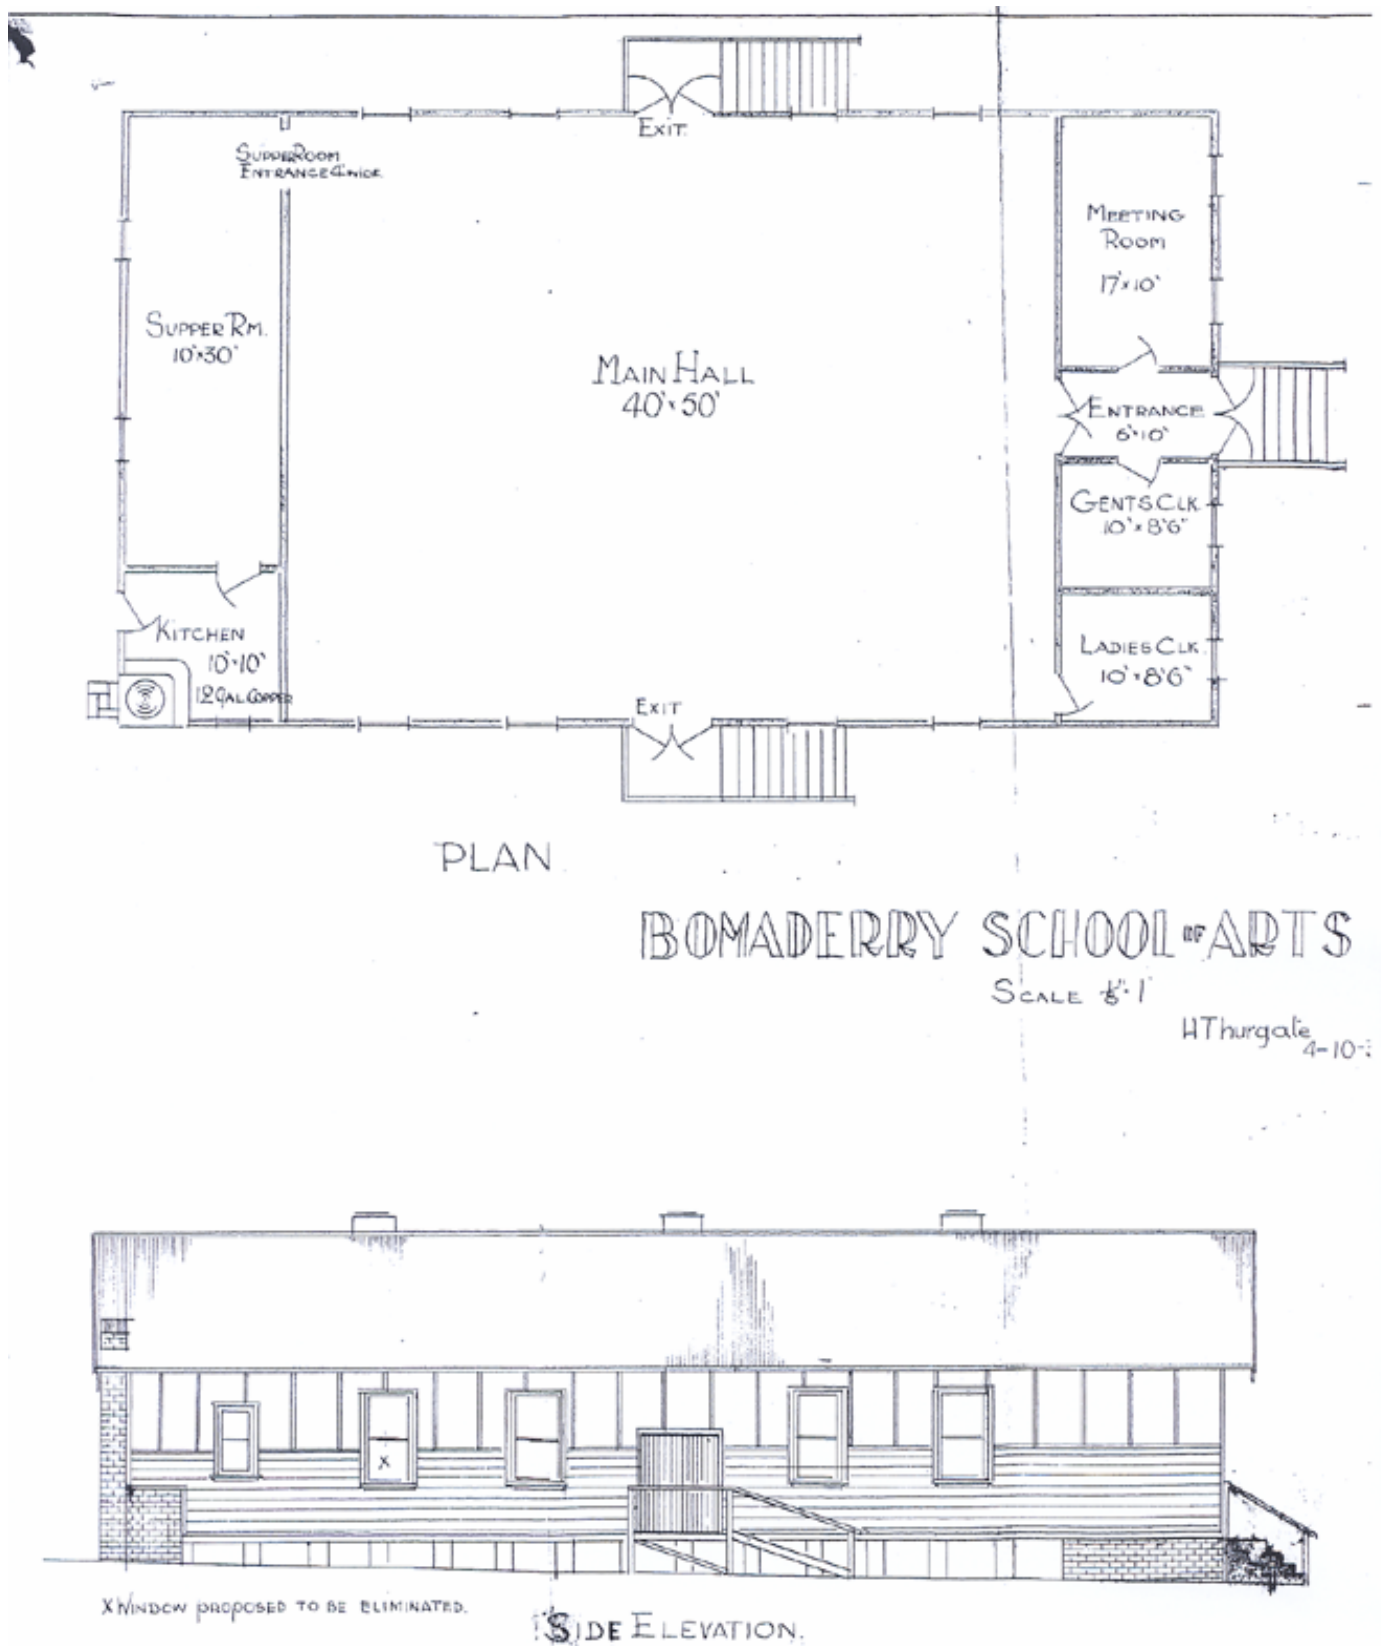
This plan (as well as Figure No.27b) from 1937 show the internal layout of the hall, as well as the hall's façade.
